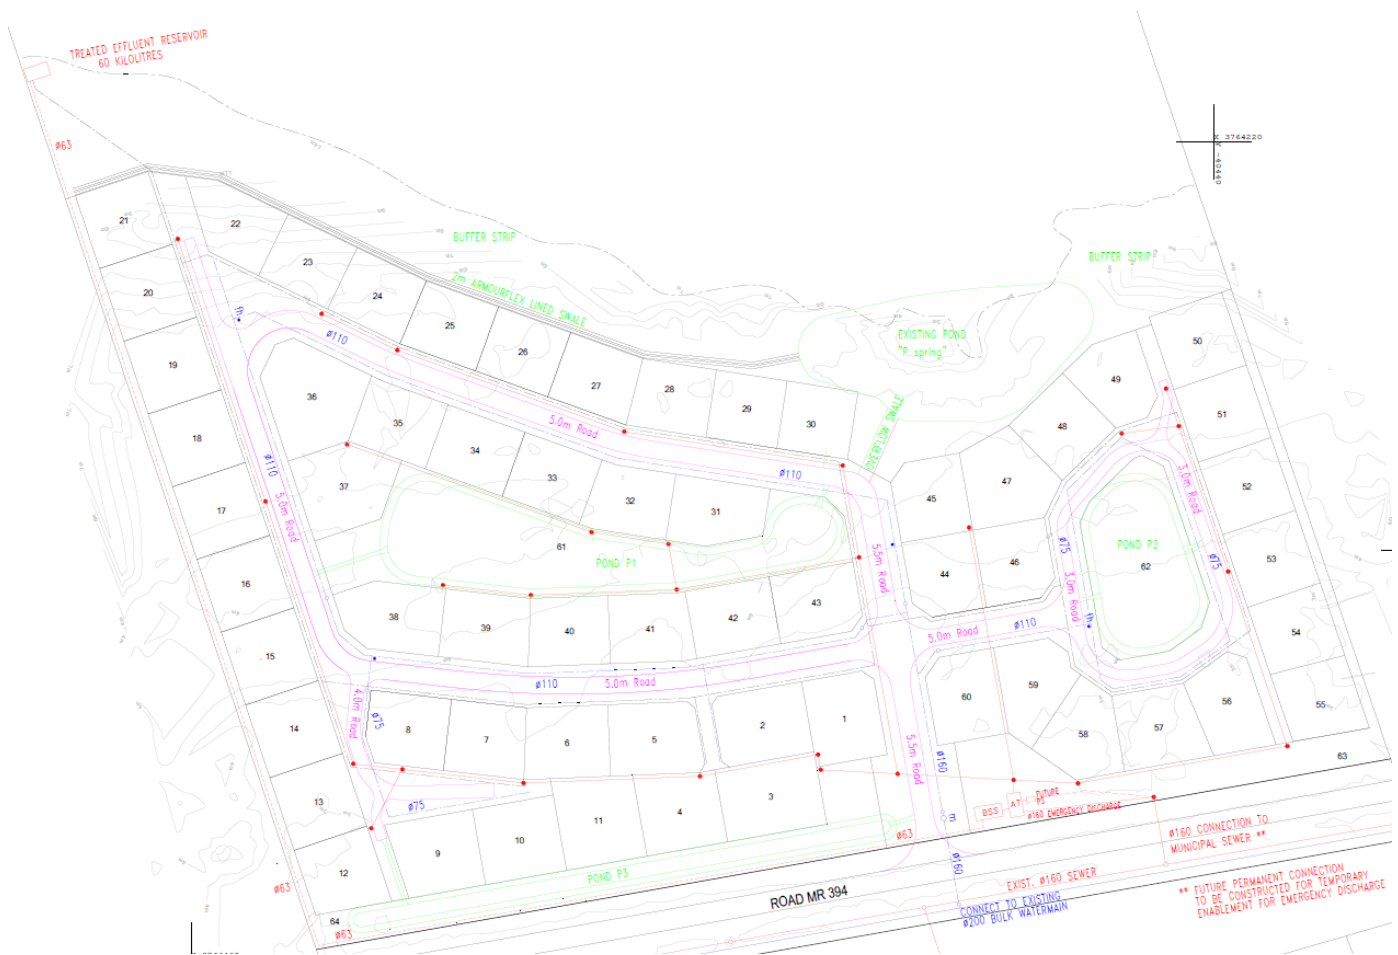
General Layout for roads, stormwater, sewer and water reticulation (Poise Consulting Engineer).
